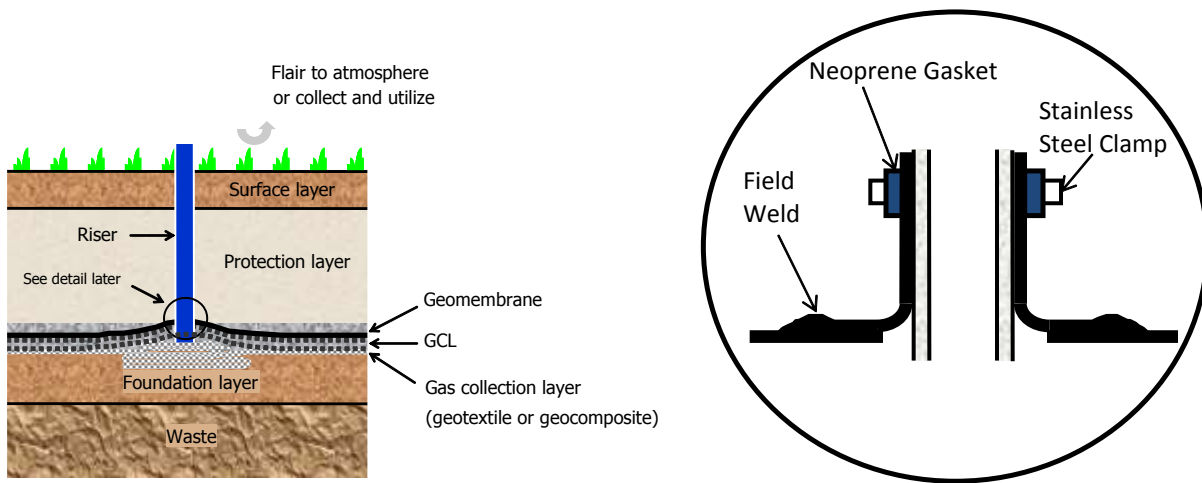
Venting system from a gas collecting geotextile beneath a geomembrane.
